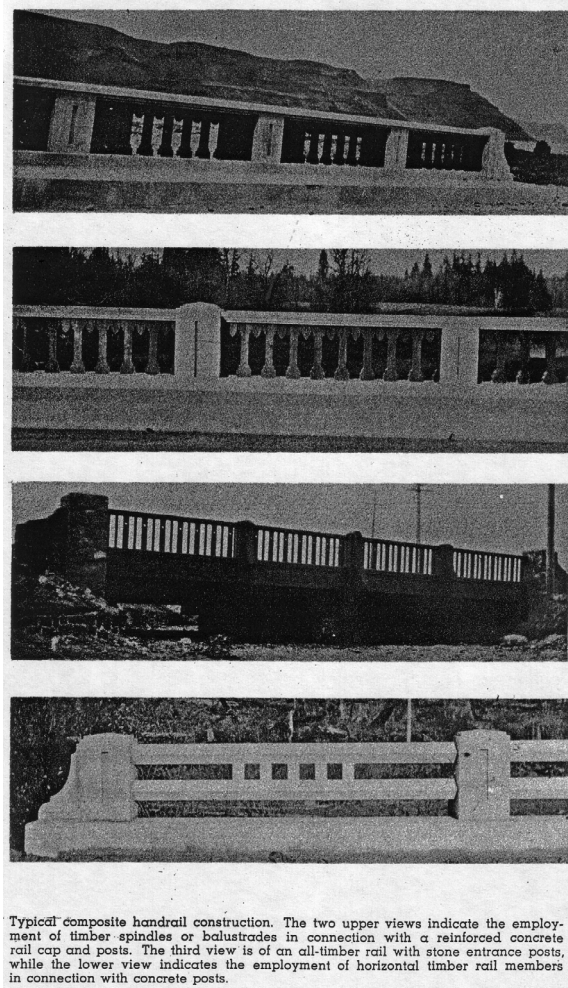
Typical Oregon Bridge Rails of the late 1930s
